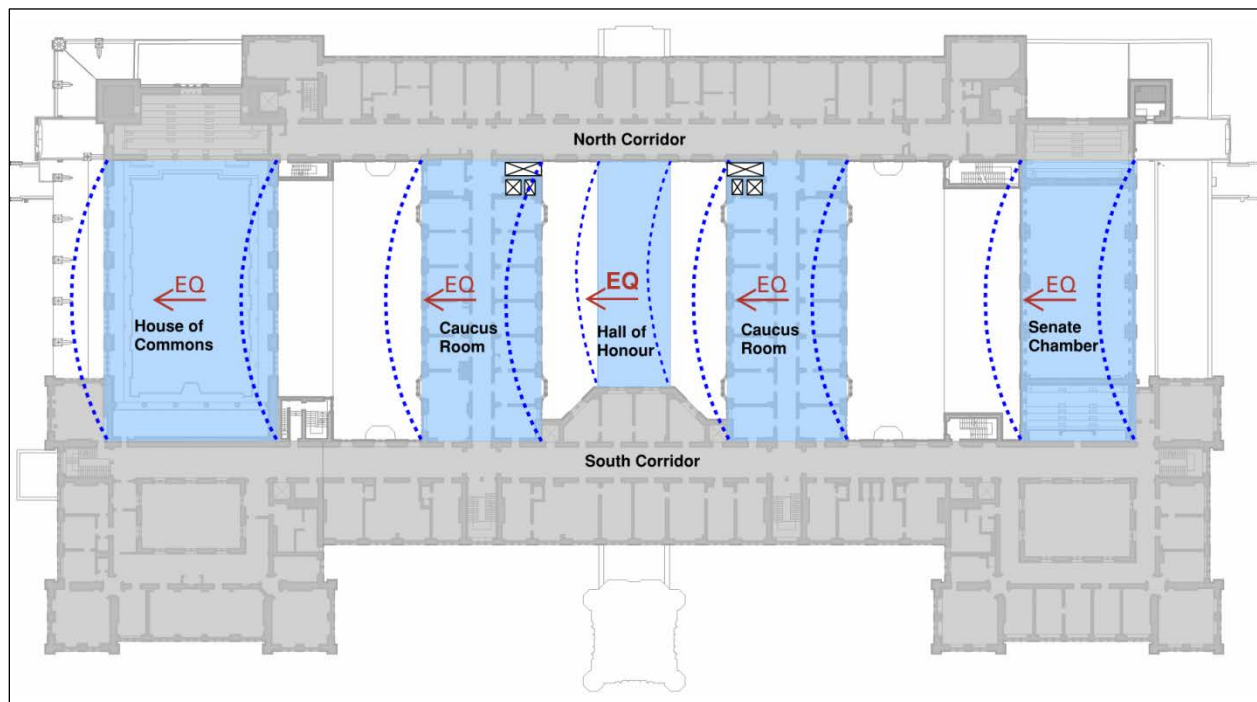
Key Plan of Large Diaphragm Span Areas
